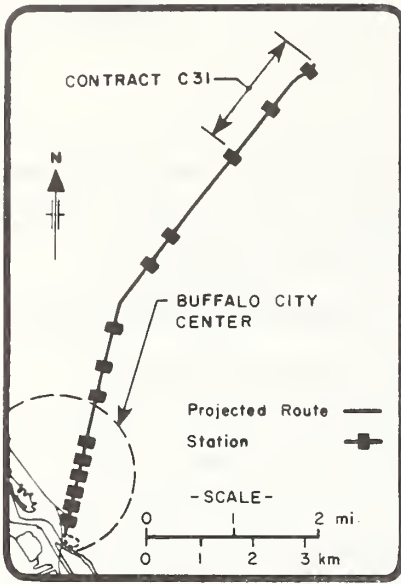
PLAN VIEW OF CONTRACT C31, OUTBOUND TUNNEL
